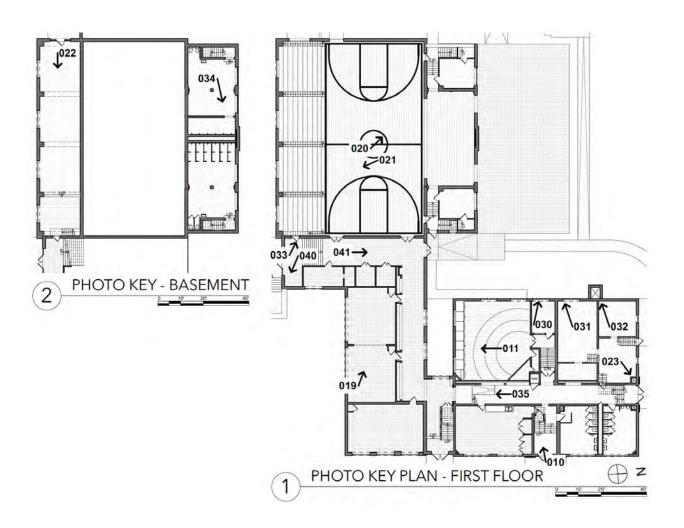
Photo key basement and first floor plan. Drawn by Adam Davenport and Jake Decker.
